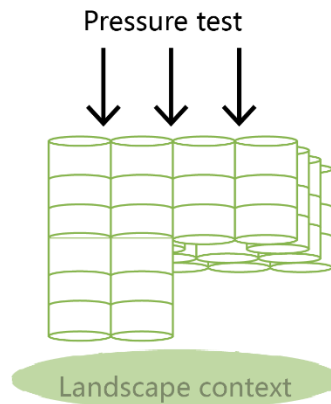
The load test for the barrel roof: The roof can hold 3200 pounds (LionsParkscape 2010).
